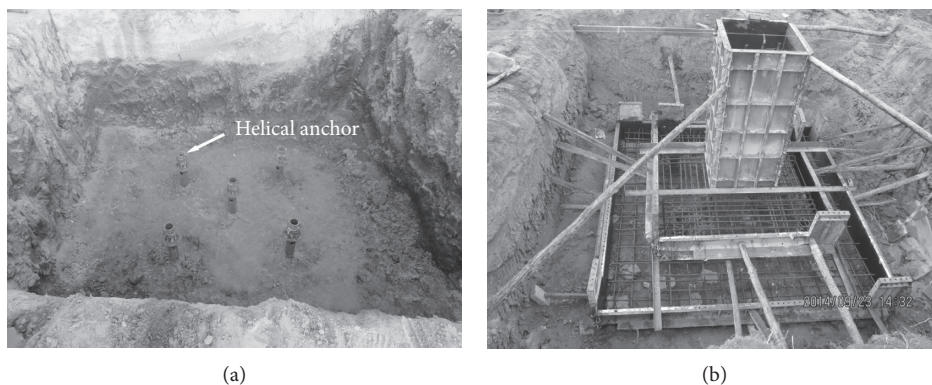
Photo of a composite foundation prior to concrete placement: (a) installed helical anchors and (b) the footing with reinforcement and supporting wall framework.
